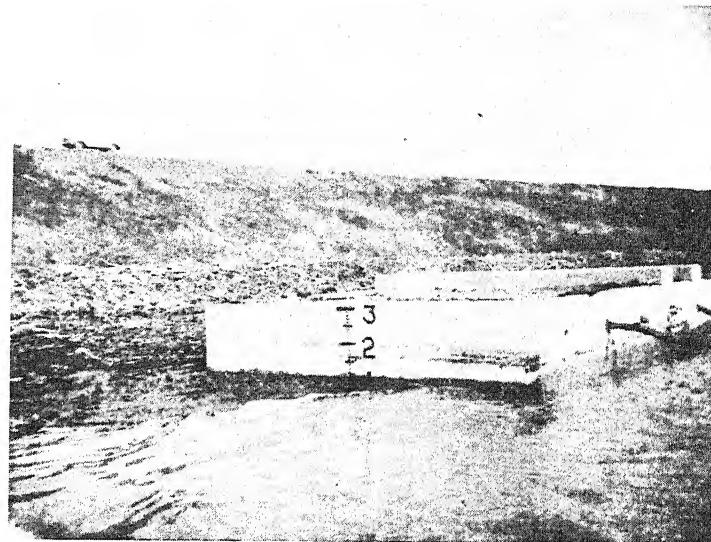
1/29/69 West face of Princ. Splway [principal spillway].
